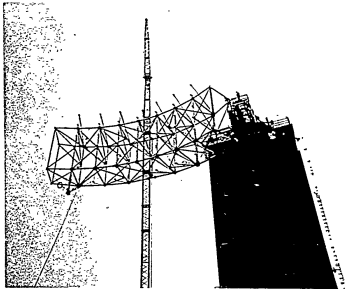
The center section of the reflector truss in transit to the tower roof. A 160-foot boom was required to allow for enough drift when booming the load in over the tower. Also visible are two tag lines to stabilize the truss during the lift.
